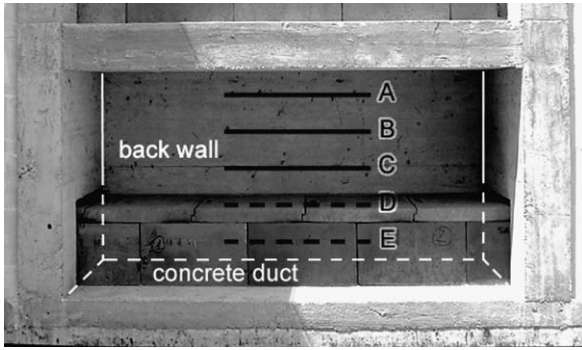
Fire test setup including the concrete duct to be tested and the back wall which was subsequently examined via the drilling resistance technique.
